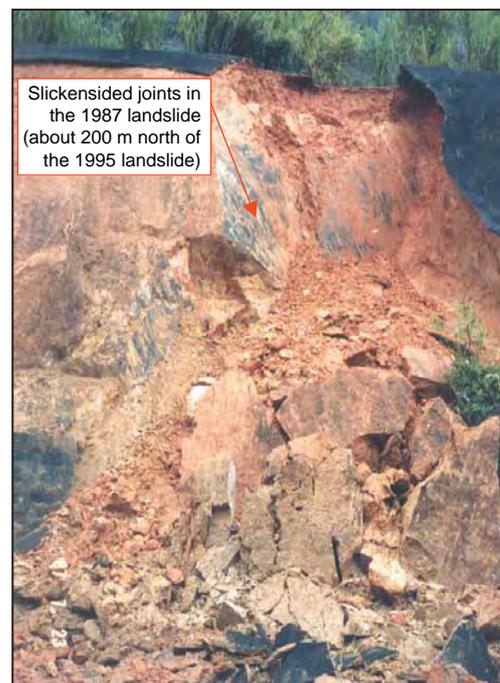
1987 landslide at Sai Sha Road with kaolin and manganese oxide coated relict discontinuities (Premchitt, 1991)
